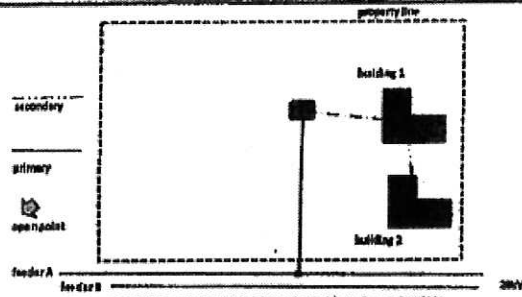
2 BUILDING CONNECTION less than 1,000kVA
